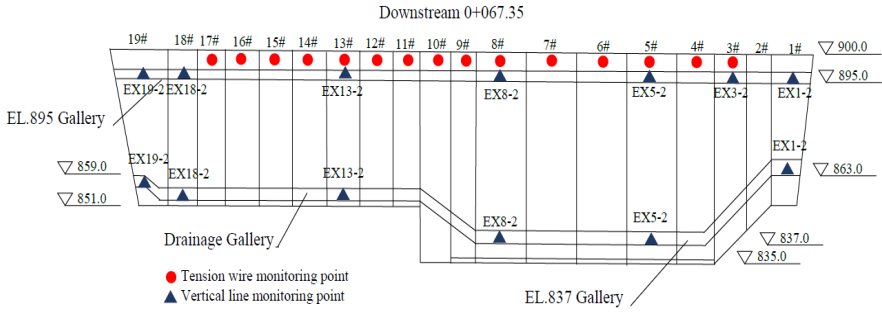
Concrete dam horizontal displacement monitoring point layout
